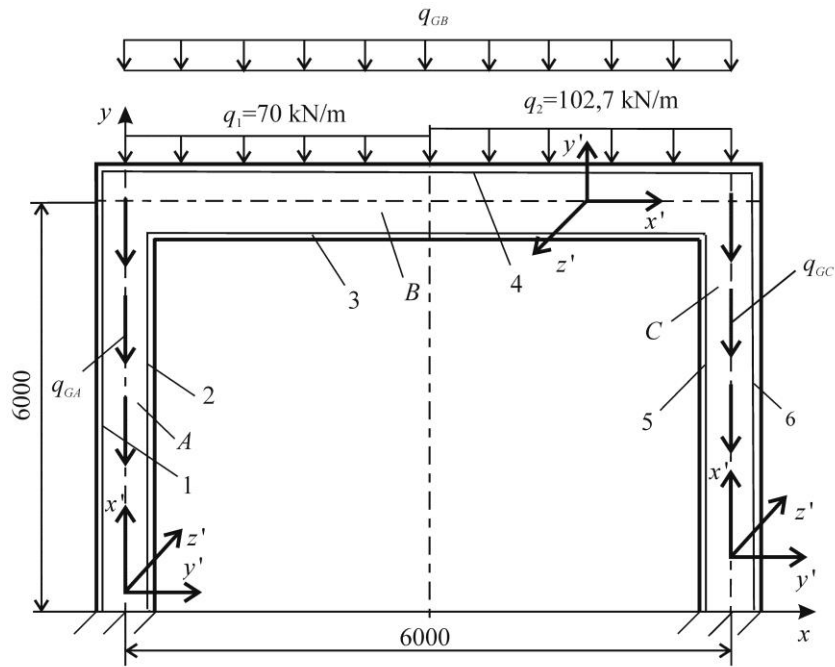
Single-span reinforced concrete frame used by Serpik et al. (2016).
